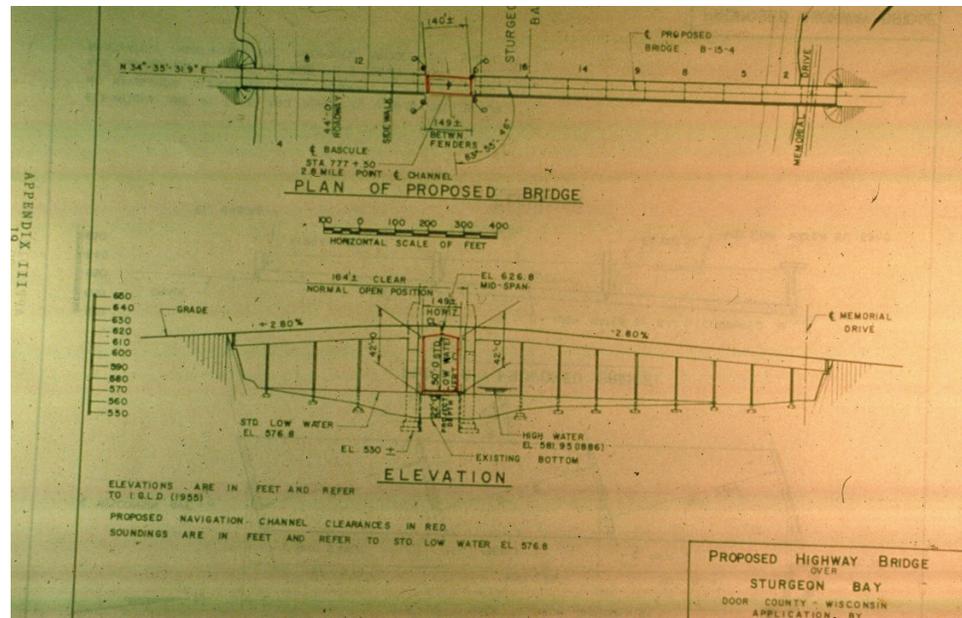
Typical “Permit Drawing” Showing Channel Width and Underclearance in Closed and Open Position
